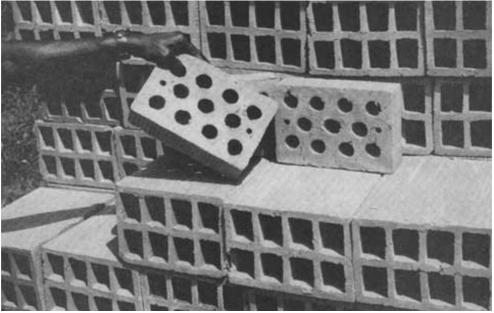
Machine-extruded and wire-cut bricks (Centre) and hollow blocks (Ghana)
